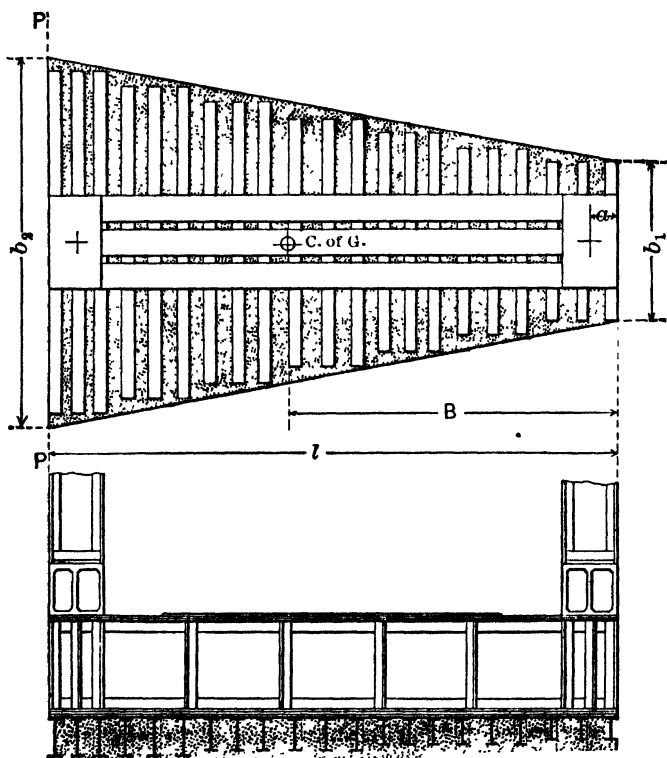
Girdering-method of Foundations. Two Unequal Loads
